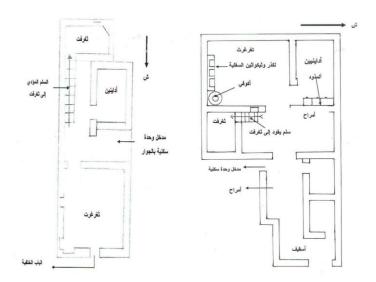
Ground Floor Plan of the Traditional House; Figure 2: Upper Floor Plan (Preliminary Sketch)
